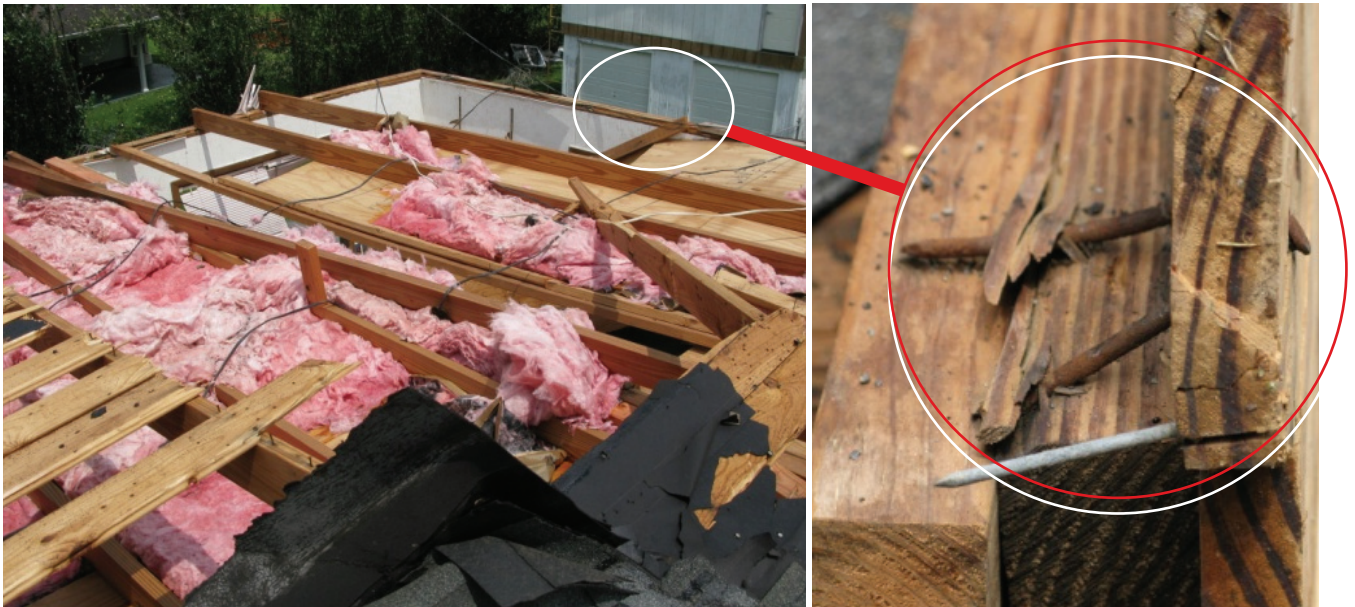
Photograph of roof damage to a house in Houma, Louisiana caused by Hurricane Gustav. The roof joists at the corner were not connected to the walls. The photograph on the right shows a close-up of the corner of the roof section that flew off of the house. There were toenails in the joist, they just had not been connected to the walls.
